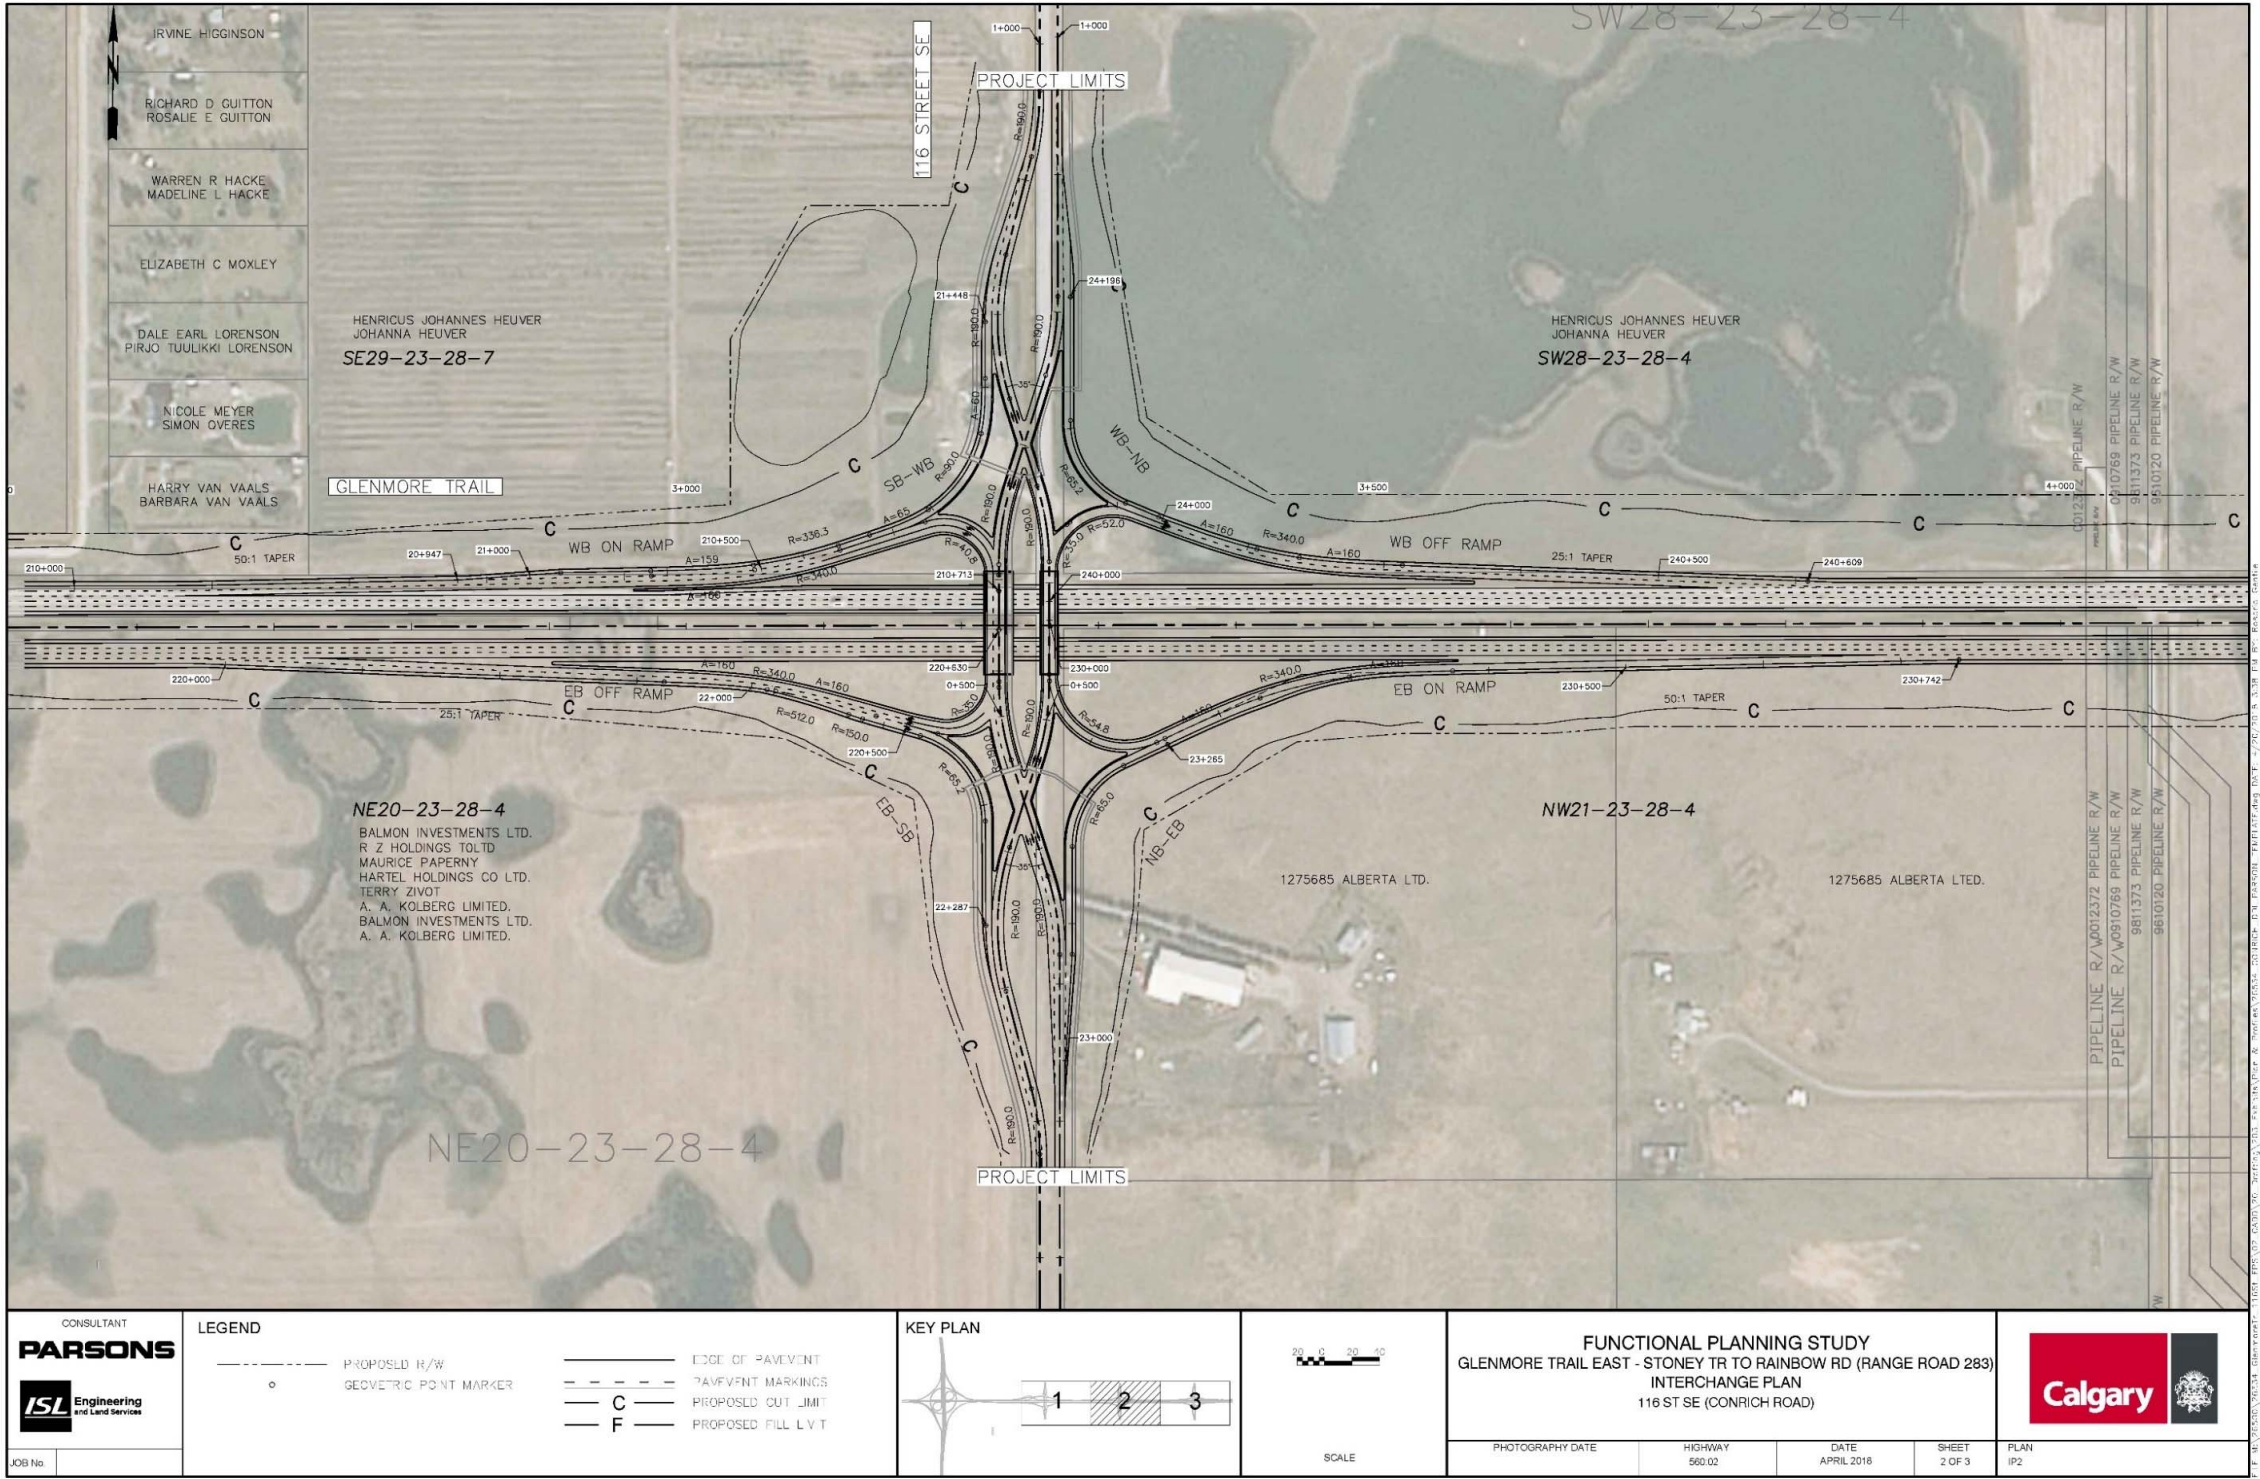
RECOMMENDED PLAN - 116 ST SE
